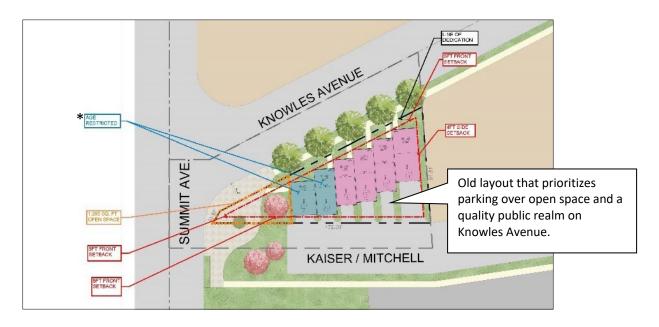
Example from Pre-Application Preliminary Plan Concept (\*Age-restricted units are no longer proposed in this Application.)
